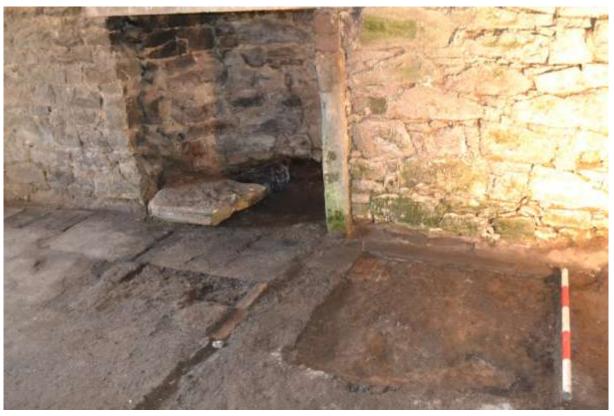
Fireplace with row of bricks on right hand side, fire surround slabs, mortar footprint of missing slab and possible setting for range or similar.
